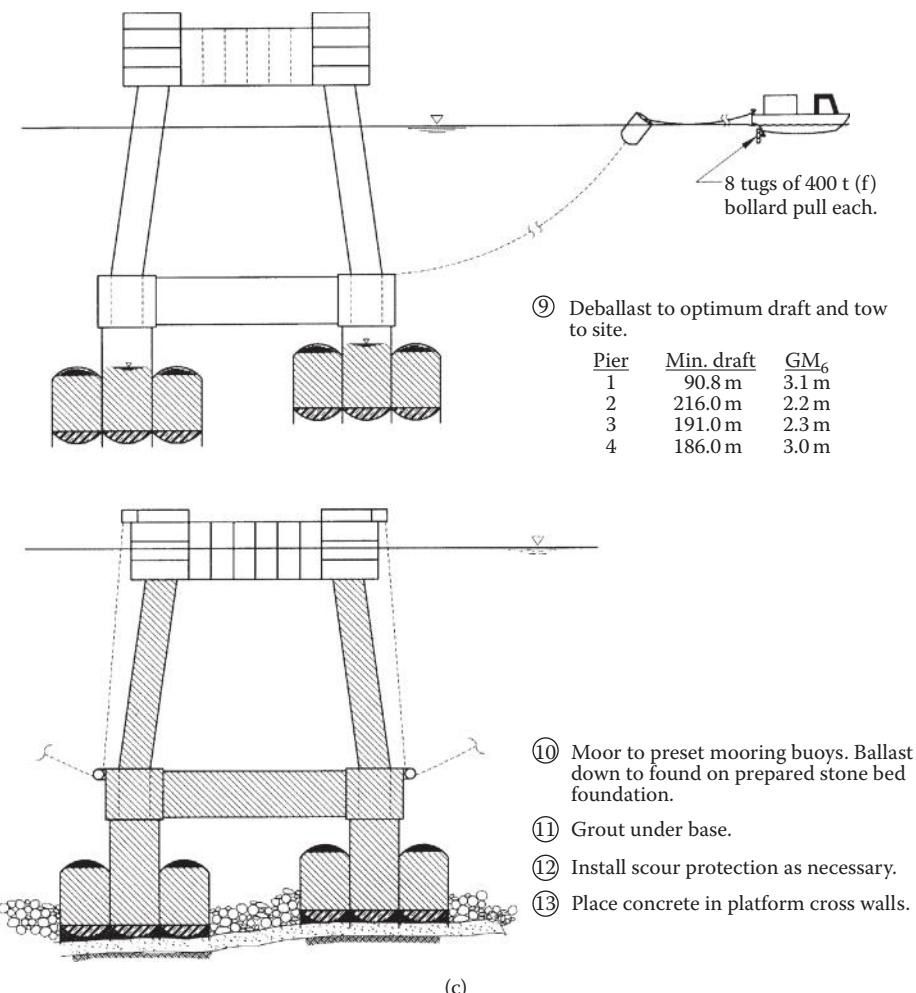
(Continued) Fabrication and installation concept for piers in 300 m water depth for crossing the Strait of Gibraltar.
